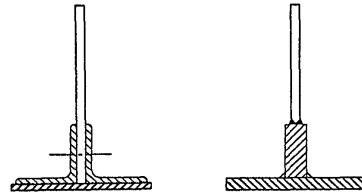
Platform roof Den Bosch Station. Original and modified lower edges of the truss.
